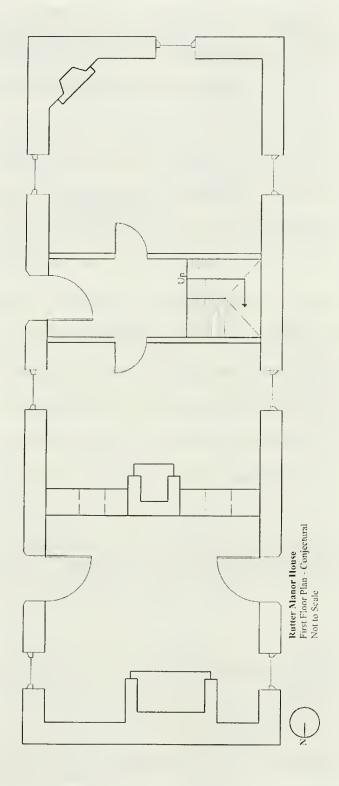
Conjectural First Floor Plan for Center Section of Main House
